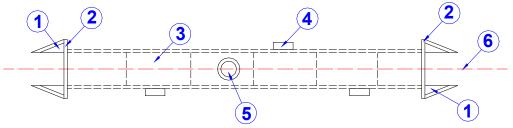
Characteristic elements of tunnel 1 - wing, 2 – portal, 3 – ring, 4 – niche, 5 – ventilation shaft, 6 – tunnel axis
